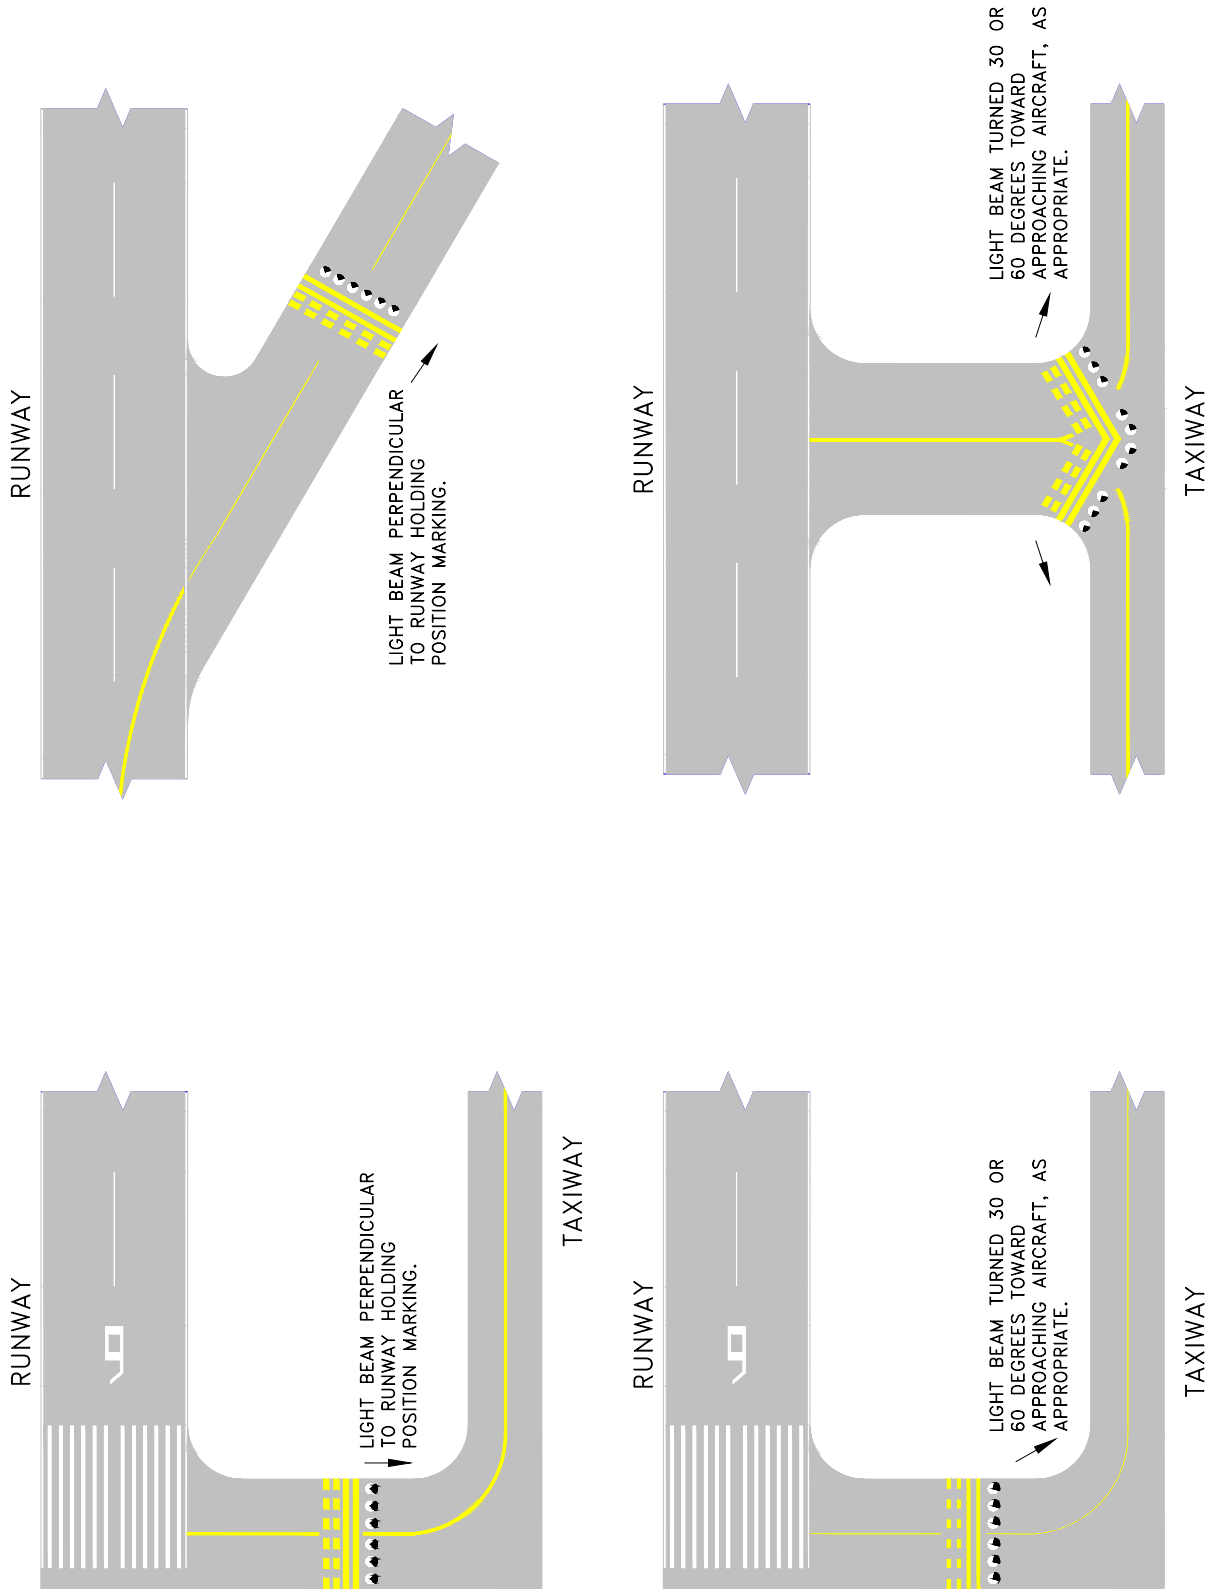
Typical Light Beam Orientation for In-Pavement RGLs and Stop Bars.
